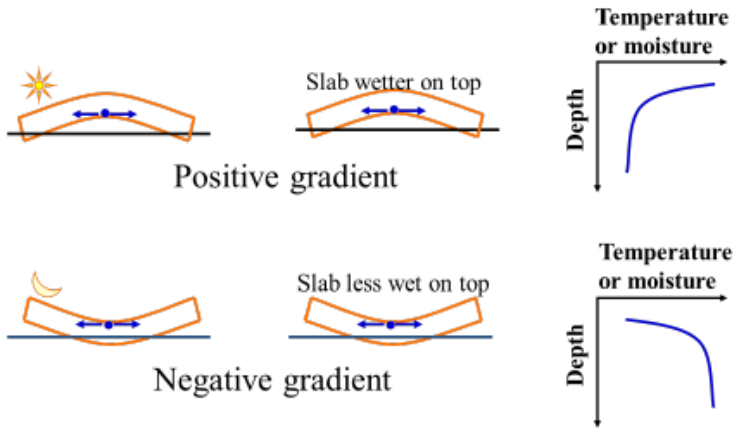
Moisture warping and temperature curling of concrete slab (Mack, 2009).
